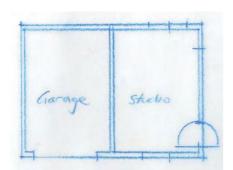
Floorplan of 1956 garage sketched by Geoff Ashley (2016, p32).
